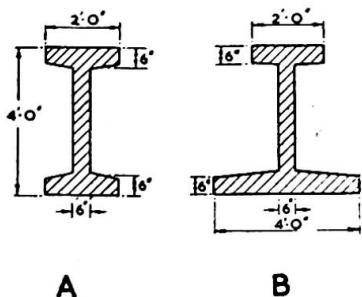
Girders of types A (partially prestressed) and B (fully prestressed).
